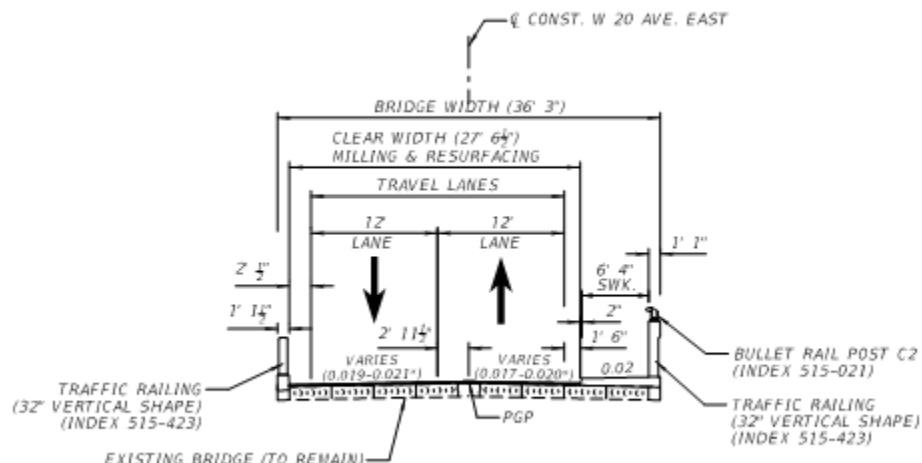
| Typical Section: West Frontage Road over Little River Canal, Bridge No. 870569
